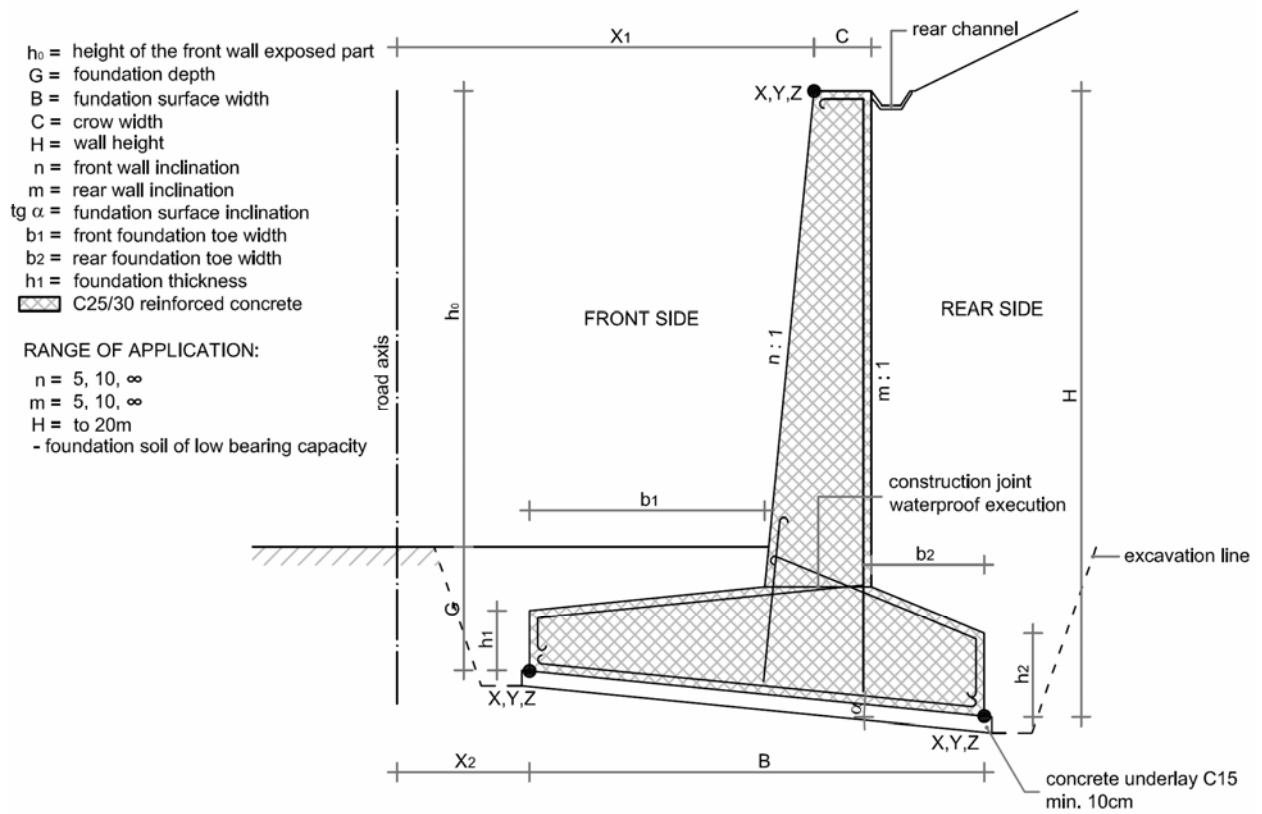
Angular reinforced concrete gravity retaining wall, including staking out data
